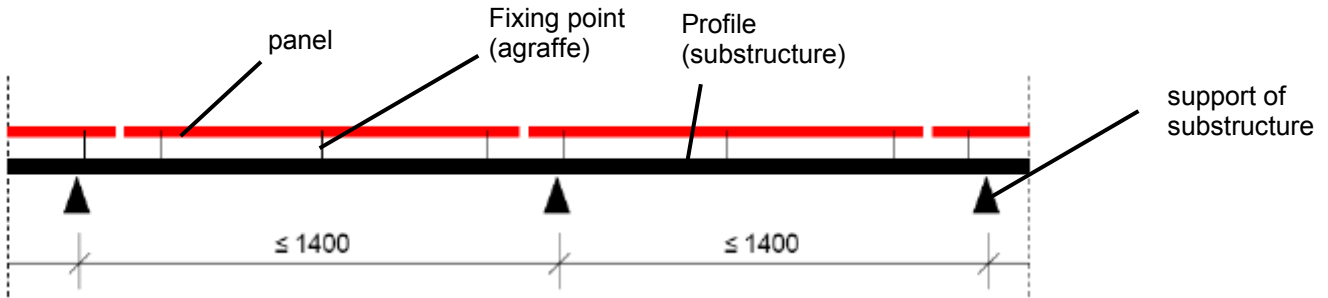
Profiles, supporting three fixing points of a panel, have a maximum spacing of the supports of 1.4 m
